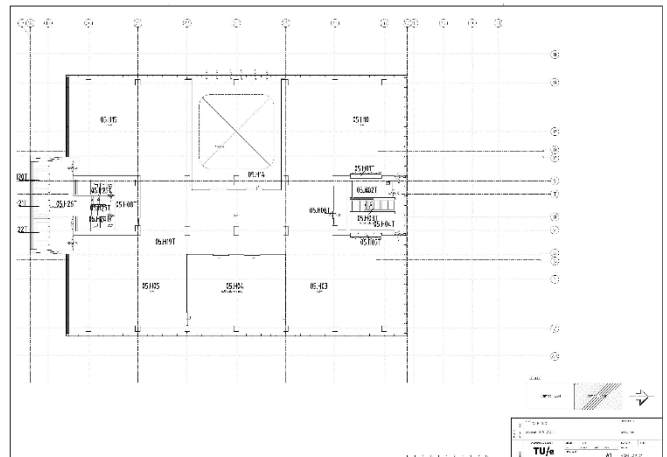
Floorplan of 5th floor side of the Vertigo.
